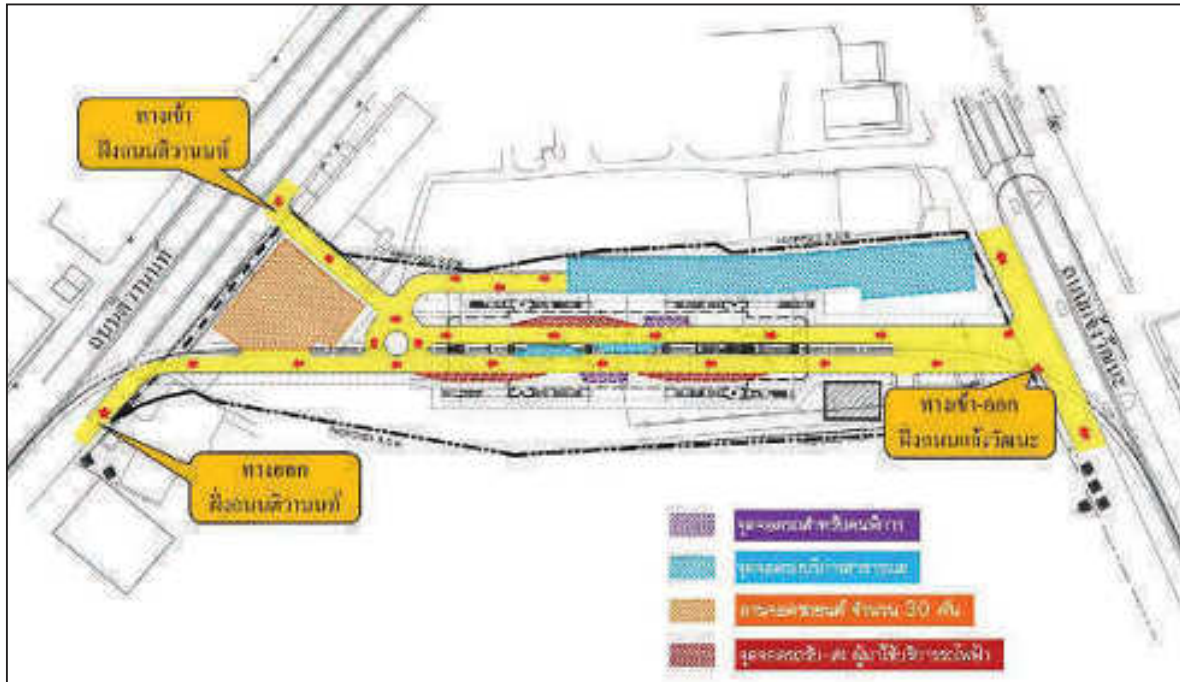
Parking Lot for Cars and Public Carriers at Pak Kret Station (PK06)
